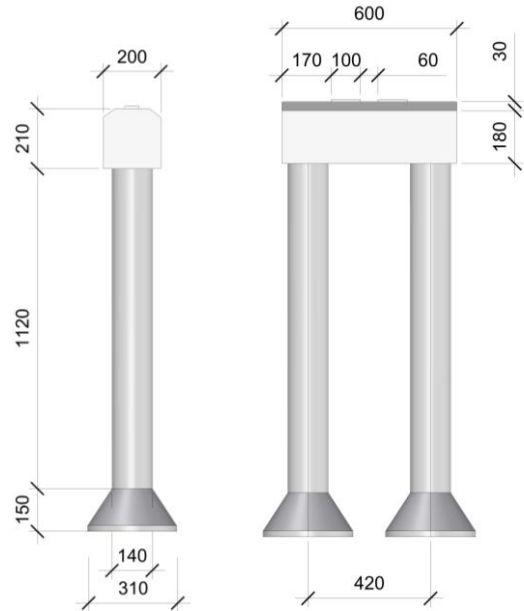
RC infrastructure bridge studied section (geometry developed in Rhino 7, dimensions in “cm”).
